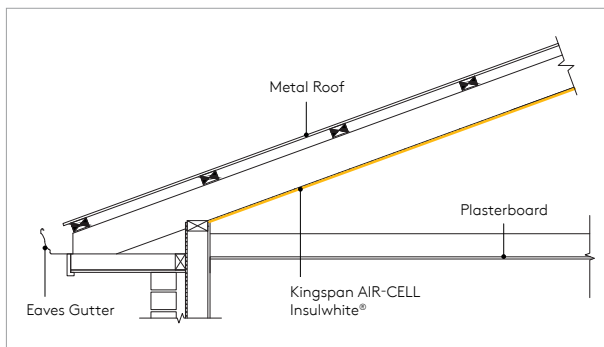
Side elevation of Kingspan AIR-CELL Insulwhite® in a pitched metal roof retrofit (attic conversion).
